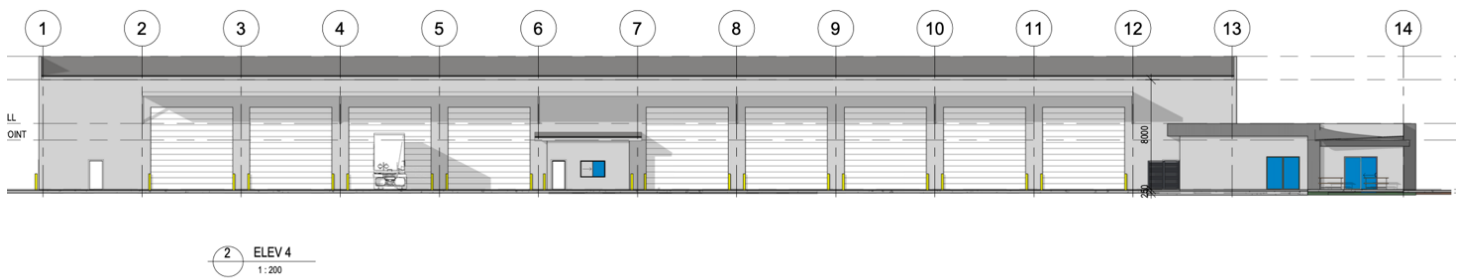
Proposed Warehouse (Source: Proposal Plans prepared by McDonald Construction)
